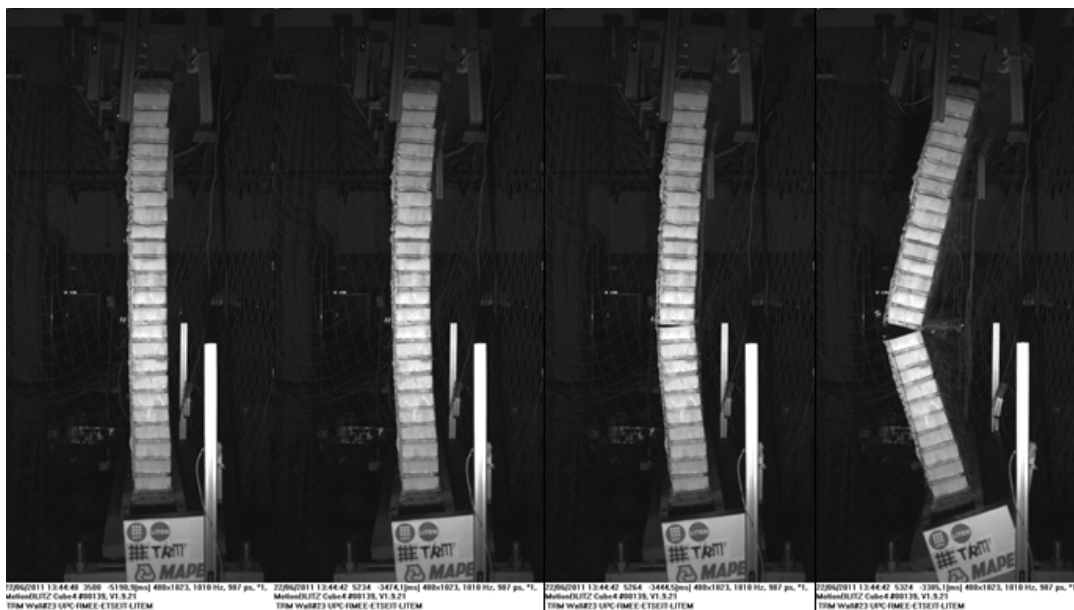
208 Failure of the wall W#23. TRM tensile fracture and horizontal joint opening
